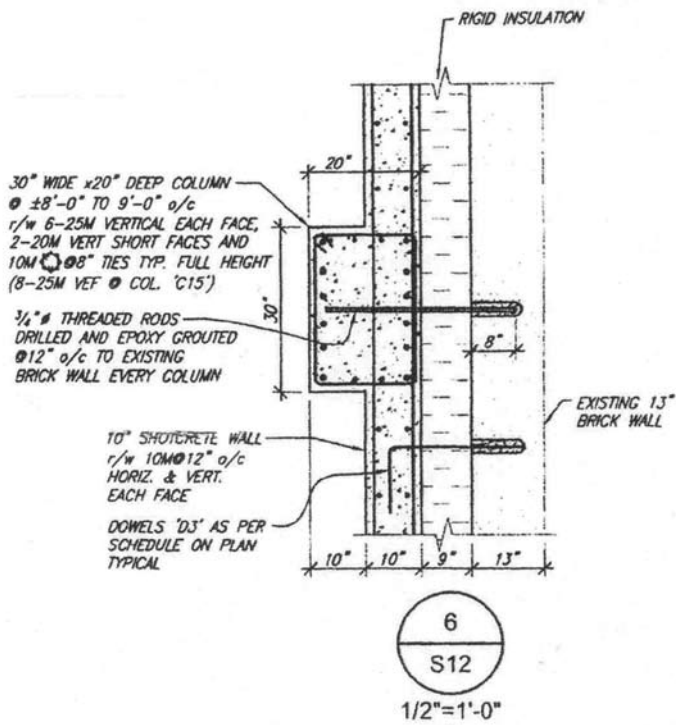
Typical wall and pilaster section detail in north building exterior wall
